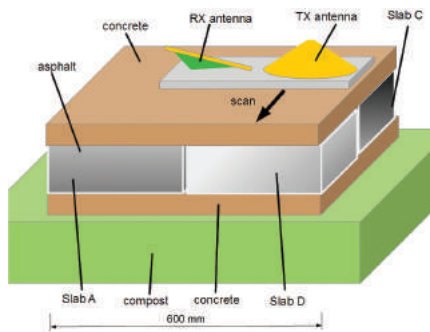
Measuring Scattering from Voids in Asphalt beneath an Undamaged Concrete Slab
